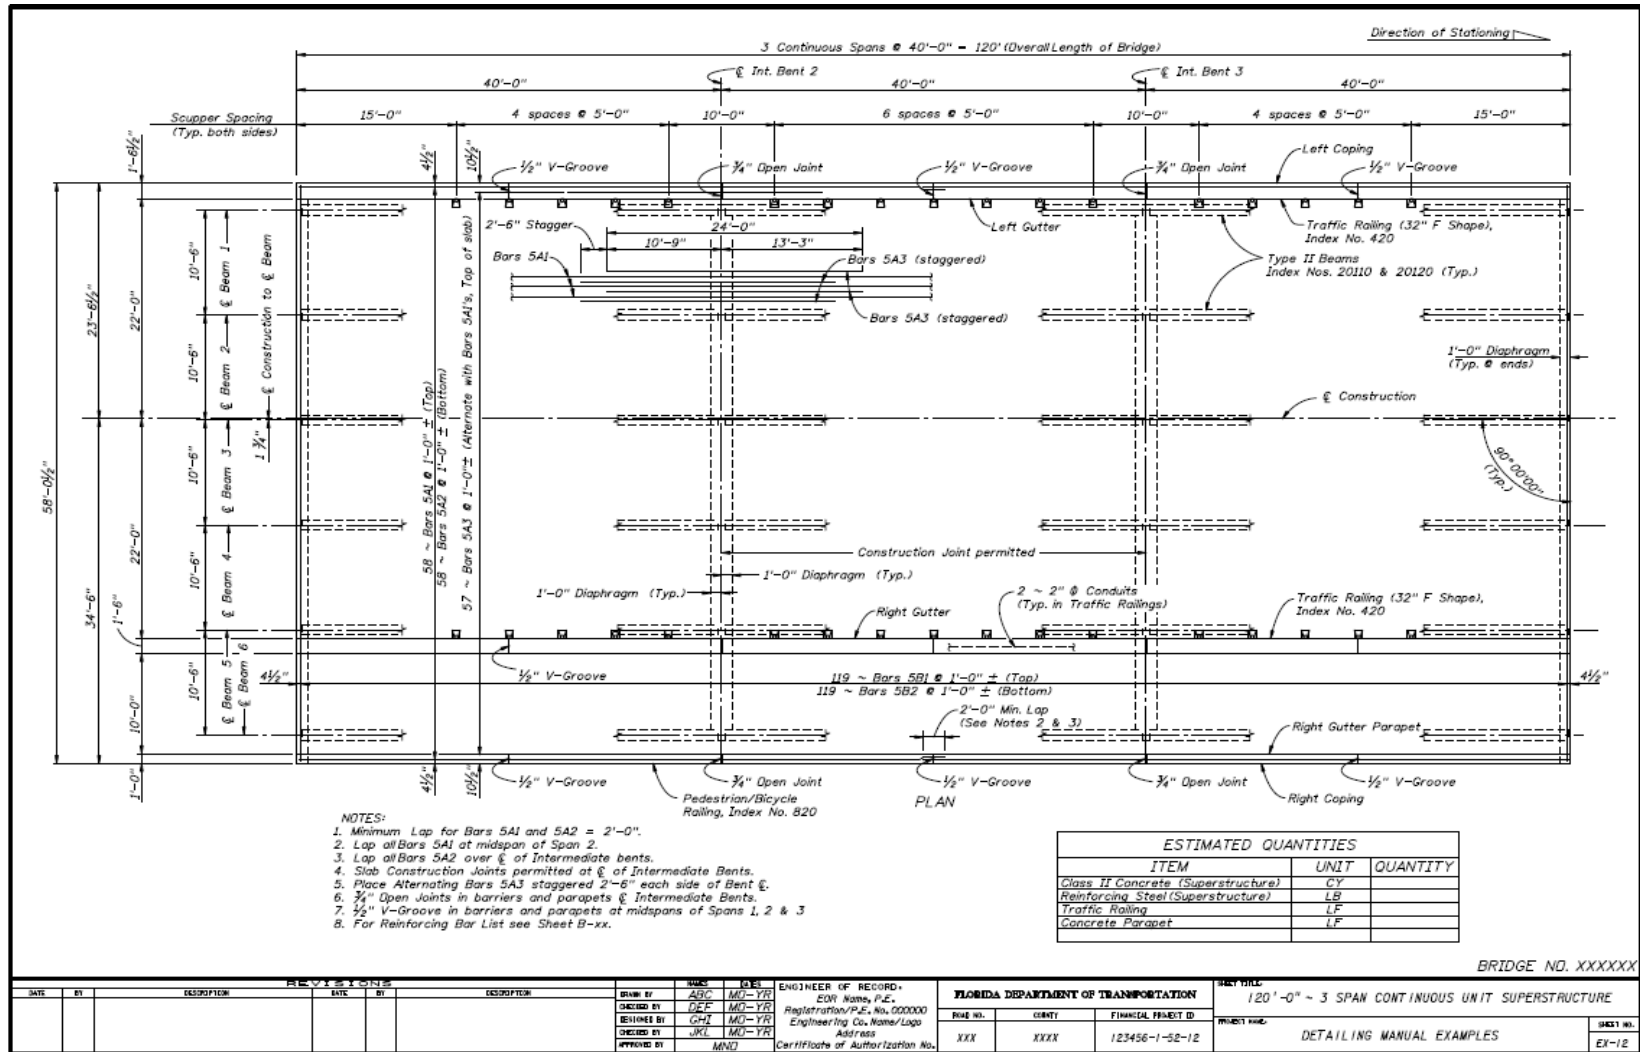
FDOT continuous deck design detail (from Robertson, 2009)
